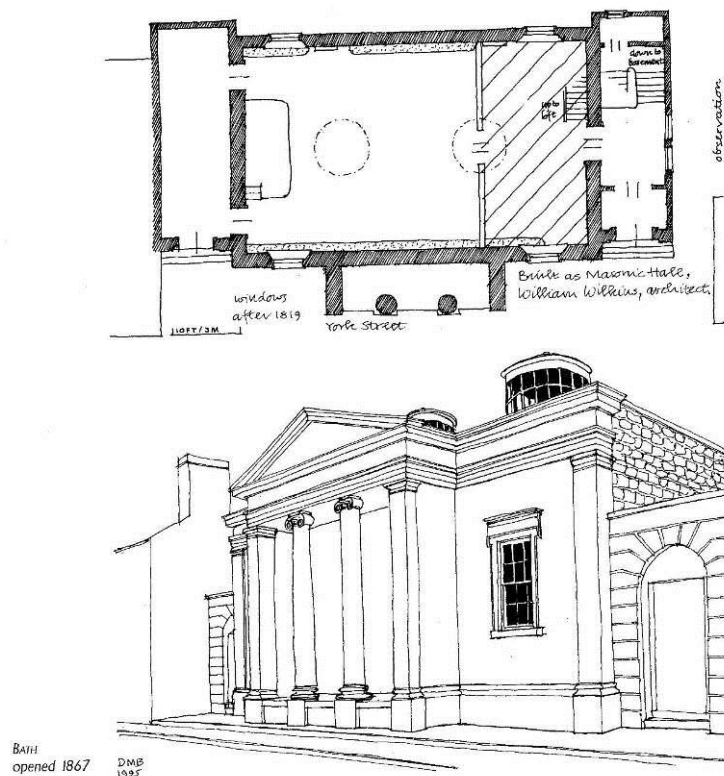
Ground plan of the upper floor c1979 before removal of the gallery, with a perspective view of the main front to York Street. North is at the top of the plan. (Butler, vol. 2, p. 530)
